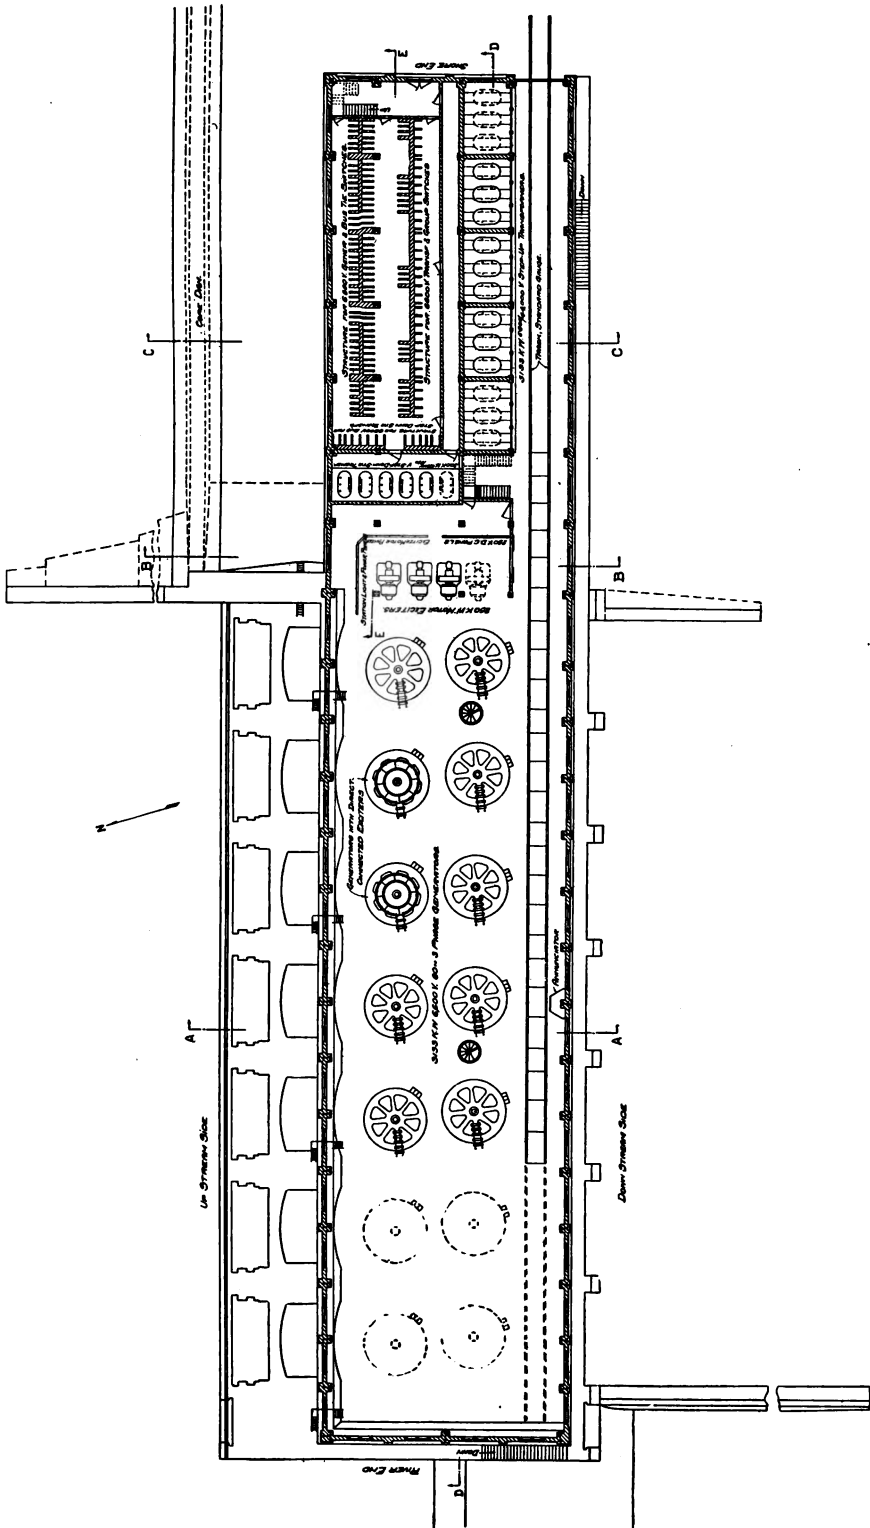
Main Floor Plan, Hales Bar Station, Chattanooga & Tennessee River Power Co.
